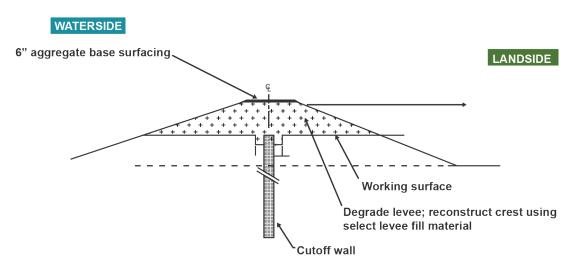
Typical Seepage Cutoff Wall—Existing Levee
